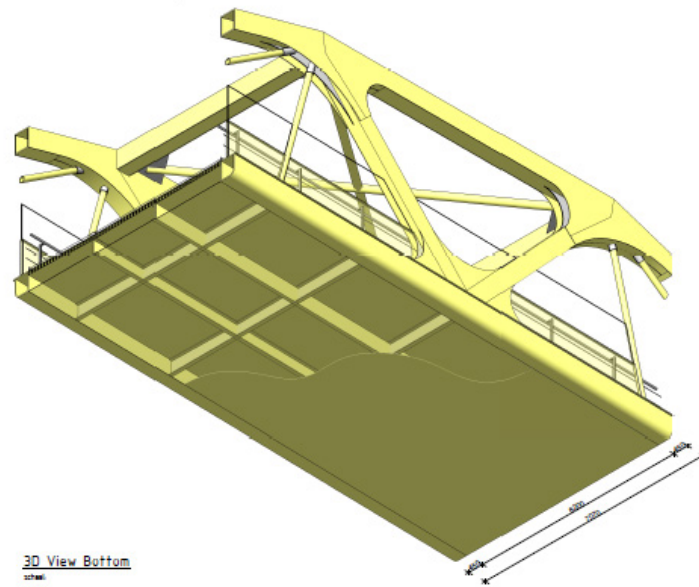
3D view showing the structure and dimensions of the bridge deck.
